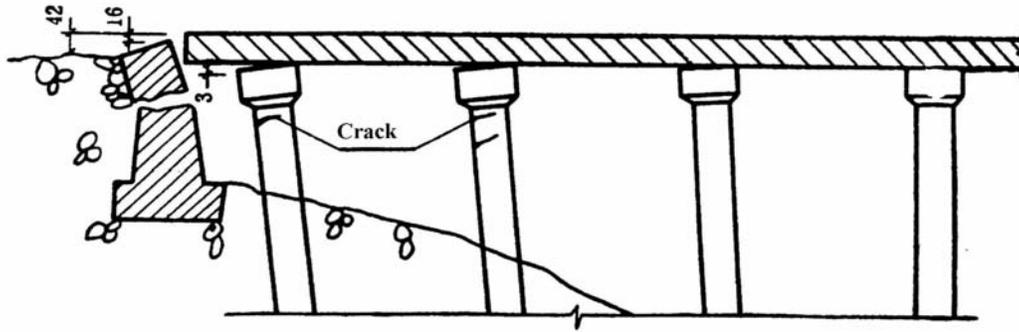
A sketch of a map showing damage to the retaining wall of the No. 20 berth at the New Port of Tianjin (in cm).
